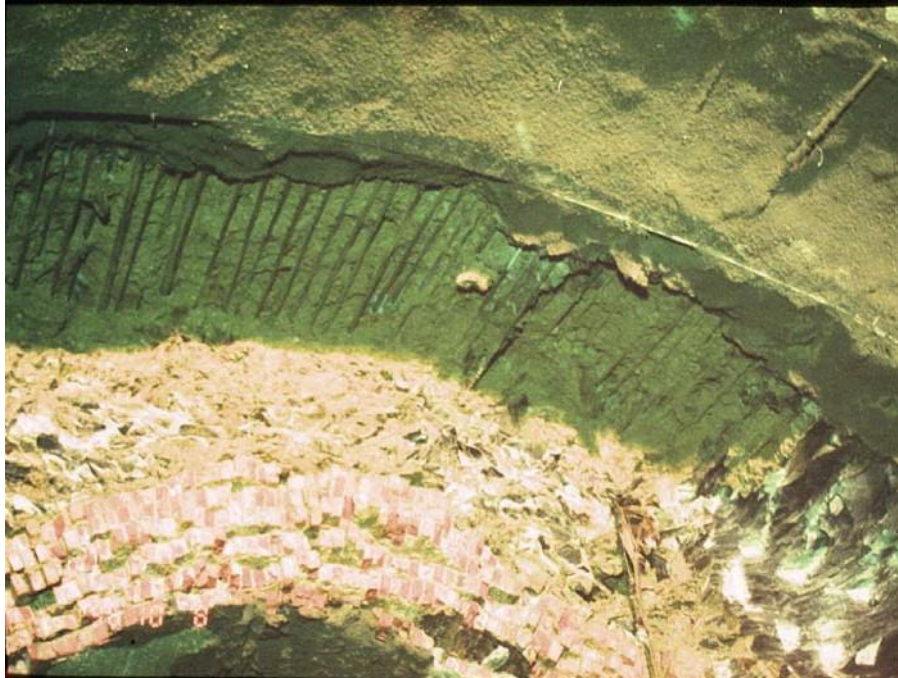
Spiling Pre-support by No. 8 Solid Rebars (Berry Street Tunnel, Pennsylvania)
